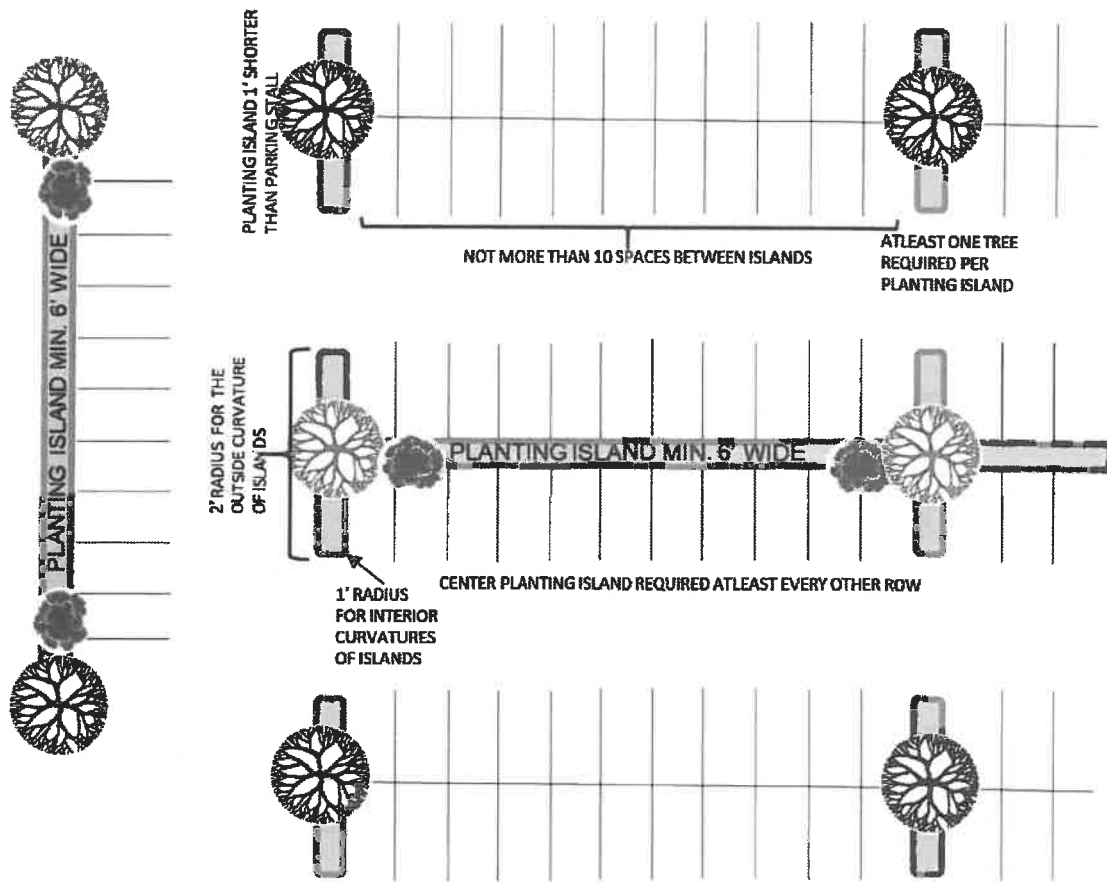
Illustration of Parking lot Design for 30-49 spaces
